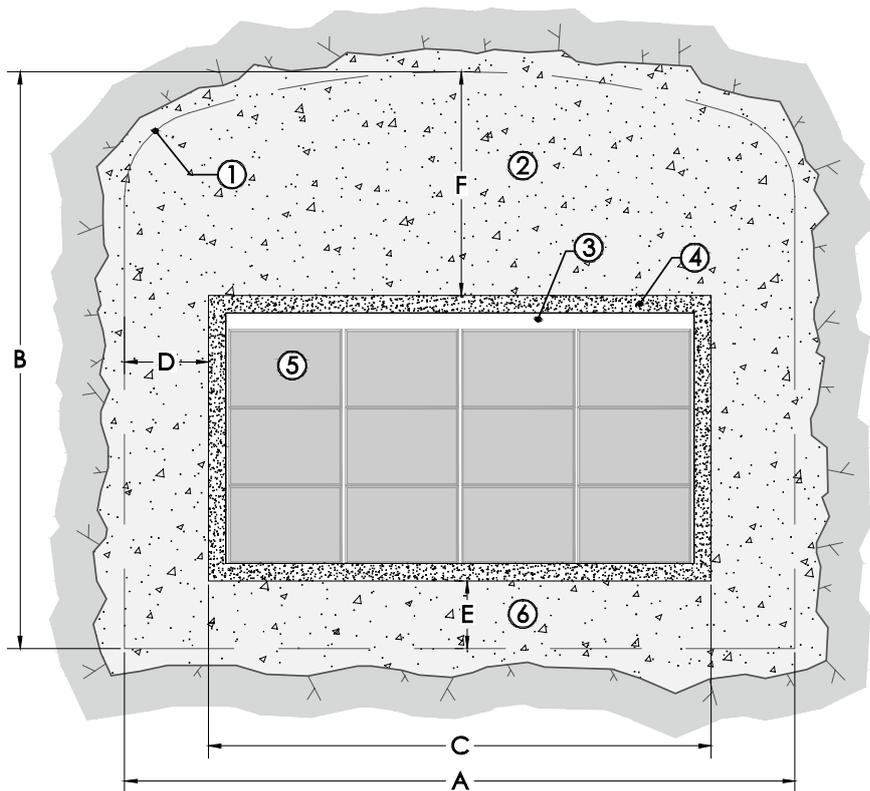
Schematic cross-sectional layout of BHK from Elfving et al. (2013). Legend: (1) Theoretical tunnel contour, (2) Concrete backfill, (3) Grout, (4) Reinforced concrete structure (0.5 m), (5) Steel tanks, (6) Concrete. Approximate dimensions: A = 20.6 m, B = 19.6 m, C = 15 m, D = 2.8 m, E = 2.4 m, F = 8.8 m. The figure is a copy of Figure 4-1 in the Initial state report.
